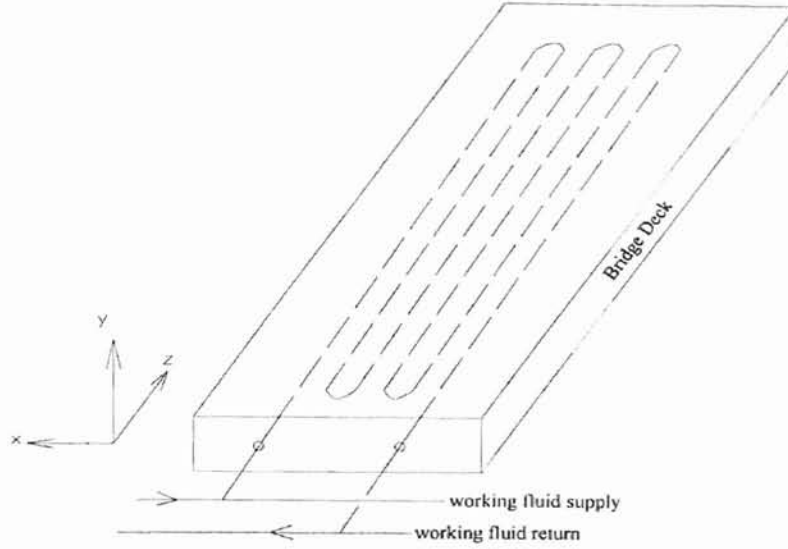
Typical arrangement of bridge deck heating pipe loop.
